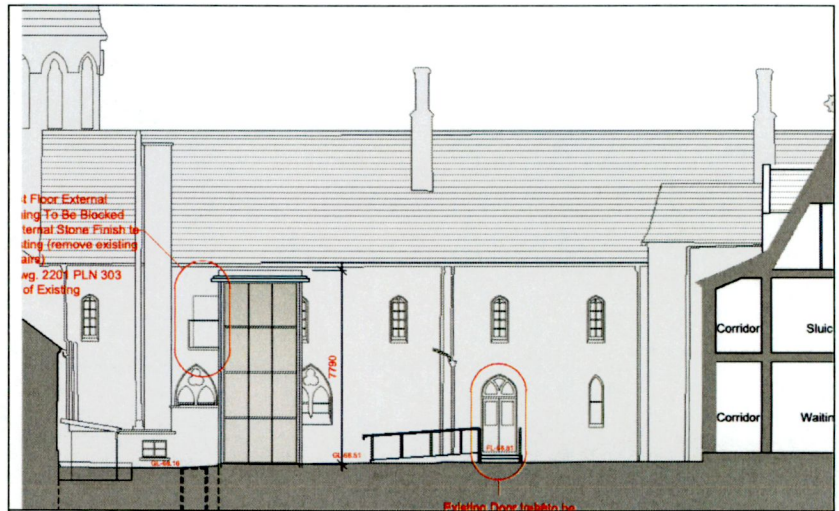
The proposed new staircase 1 – glazed curtain walling and zinc cladding are the main materials.
